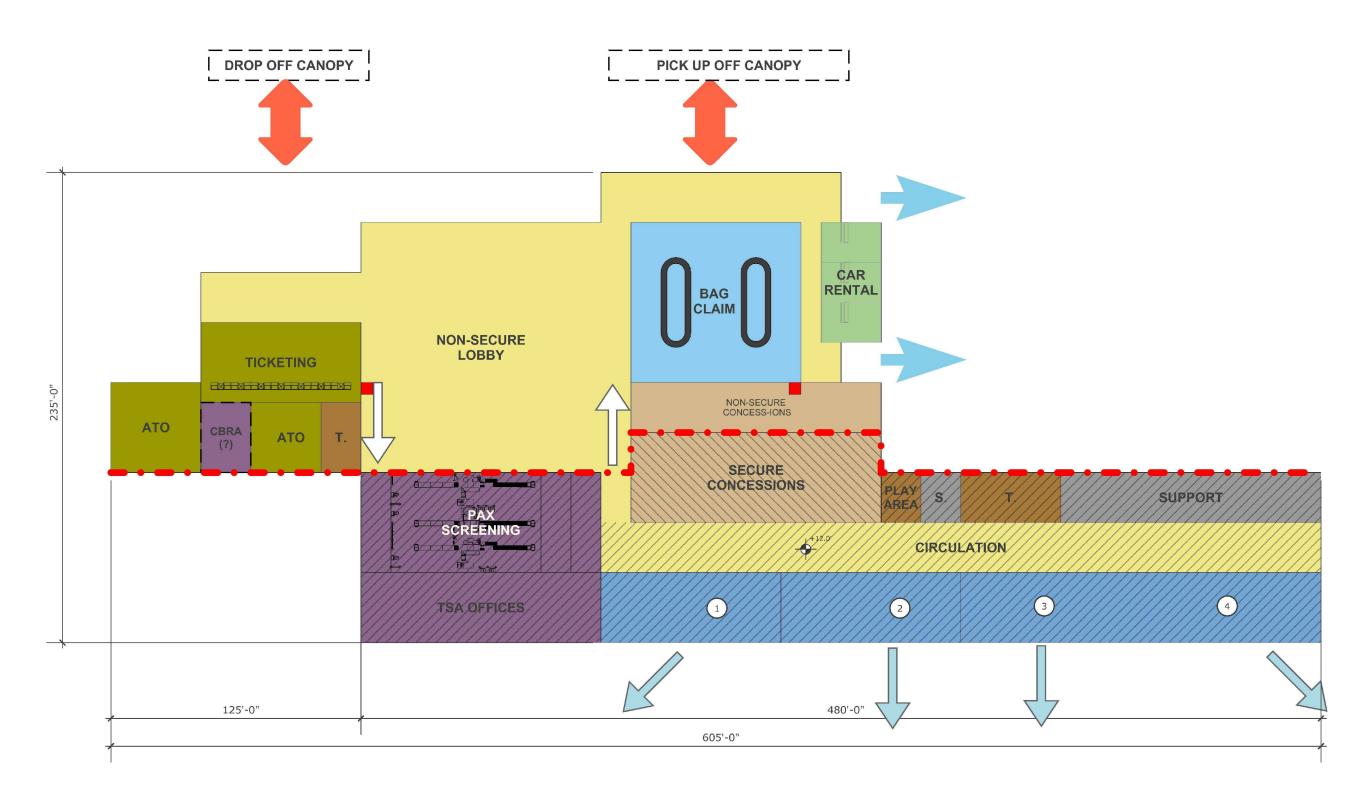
Terminal Building Alternative 4B - Interior Layout
